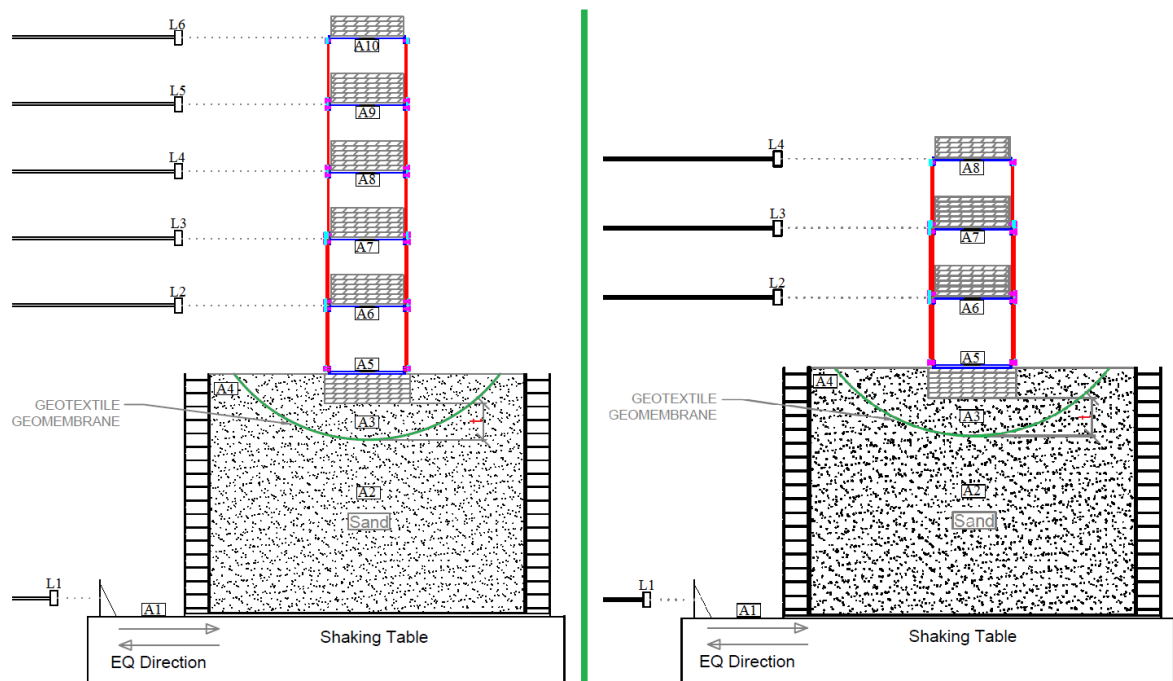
Sketch of Proposed GSI System Experiment Setup with 5-story and 3-Story Scaled Building Models (Sekman, 2016).
